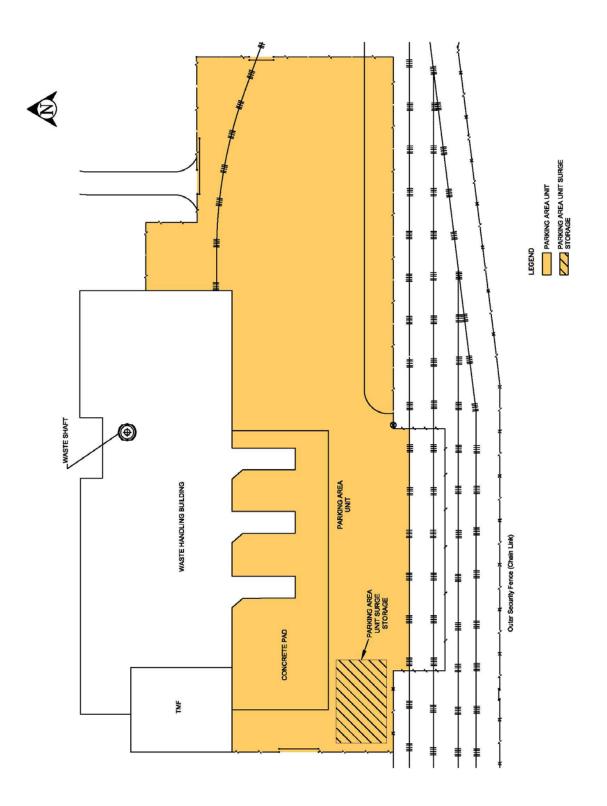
Parking Area Unit – TRU Mixed Waste Container Storage and Surge Areas
